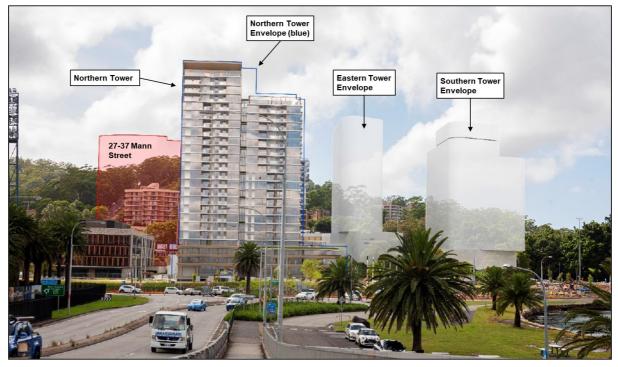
| Perspective looking east along the Central Coast Highway towards the development in context with future proposed towers (Base source: Applicant's RtS)
